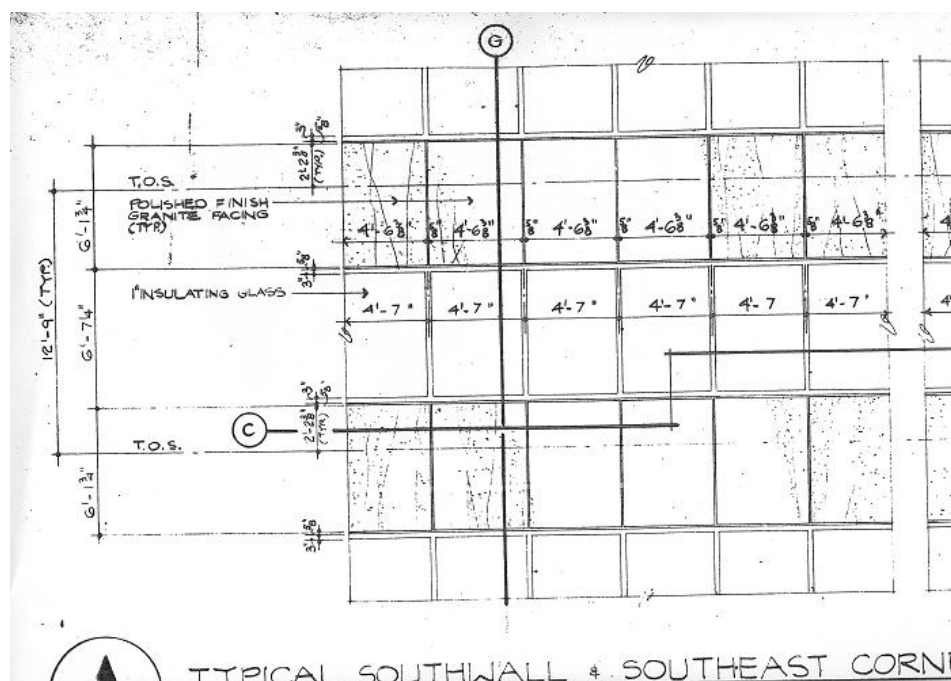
WTC 7 Architectural Drawing 38, Detail A: Typical Southwall and Southeast Corner Elevation.
